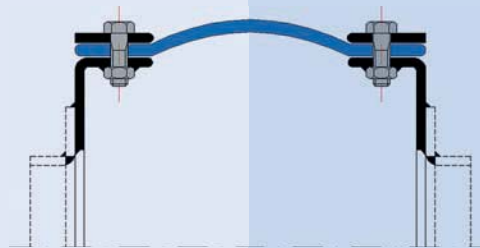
B: Sample metal frame with flat flanges, and no liners, welded to ductwork.
